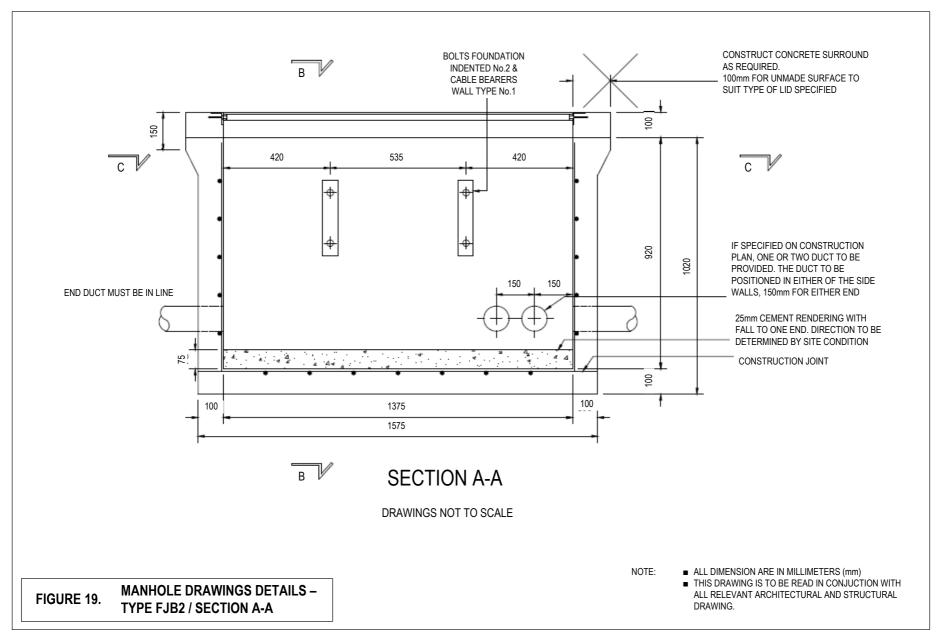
Manhole drawings details - Type FJB2 / section A-A
